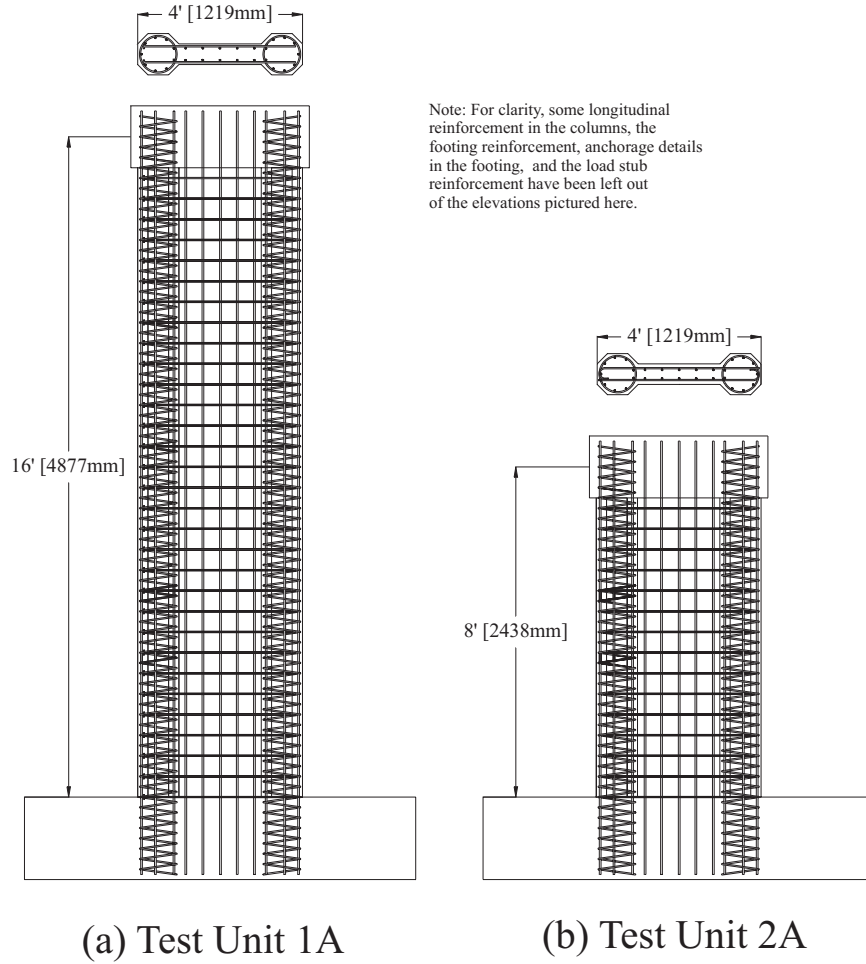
(a) Test Unit 1A section and side elevation with column reinforcement. (b) Test Unit 2A section and side elevation with column reinforcement.
